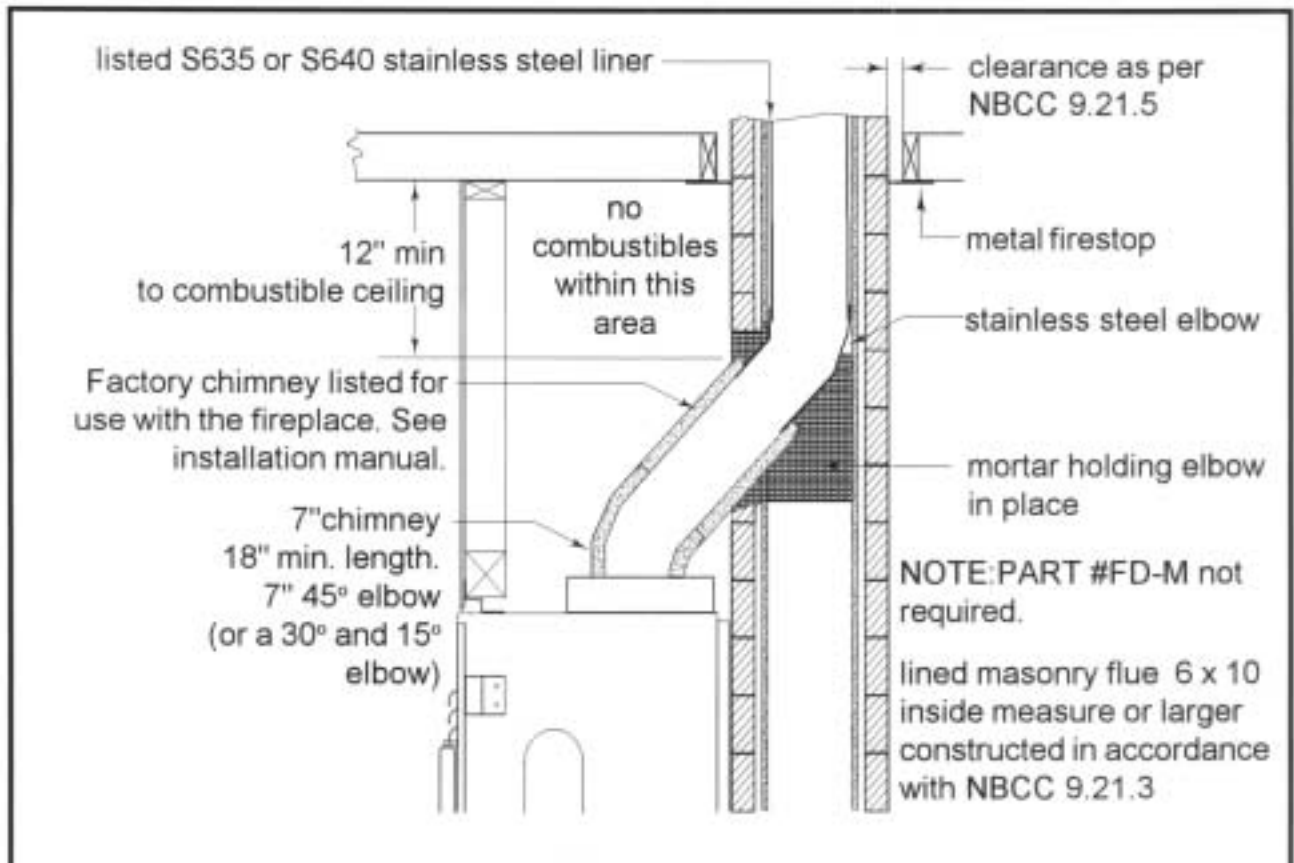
Connection to a masonry chimney with a stainless steel elbow
